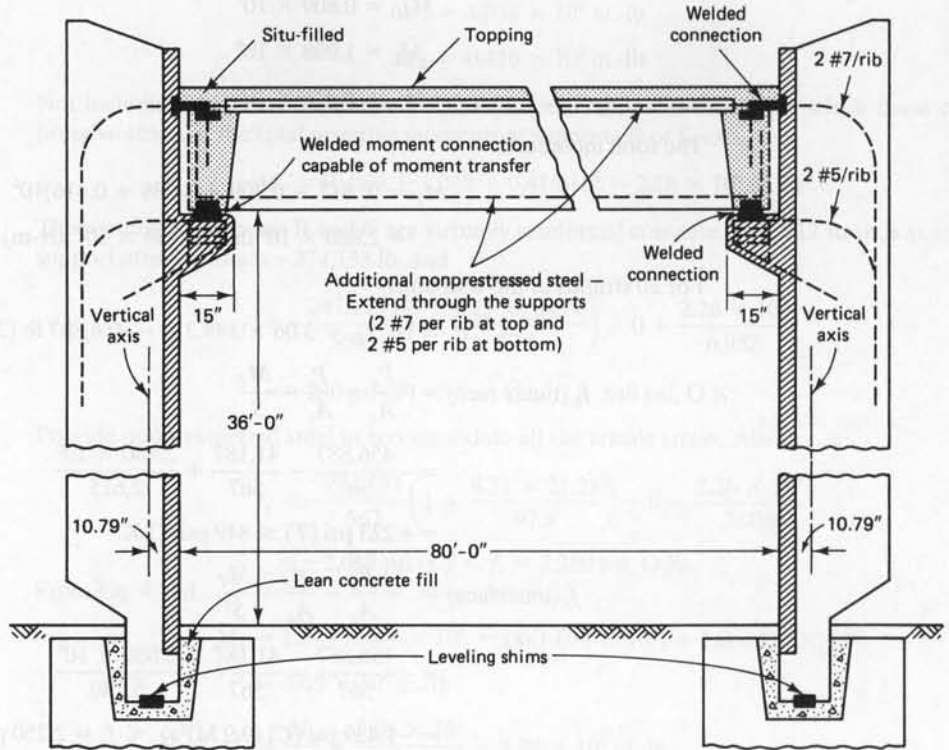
Sectional elevation and connection details of frame in Example 6.7.
